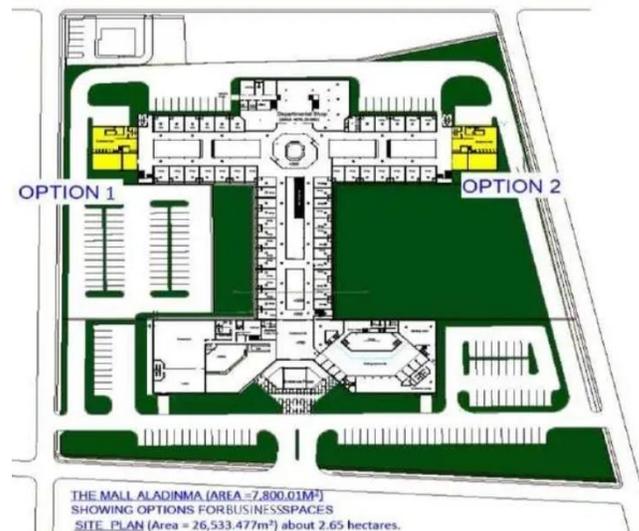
Ground floor plan of Aladinma Shopping Mall. Source: Archival Records of Concessionaire.
